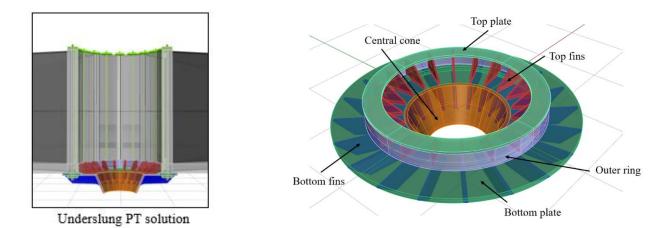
Central tether connection developed during Stage 2. All plated steel specified as S420.
